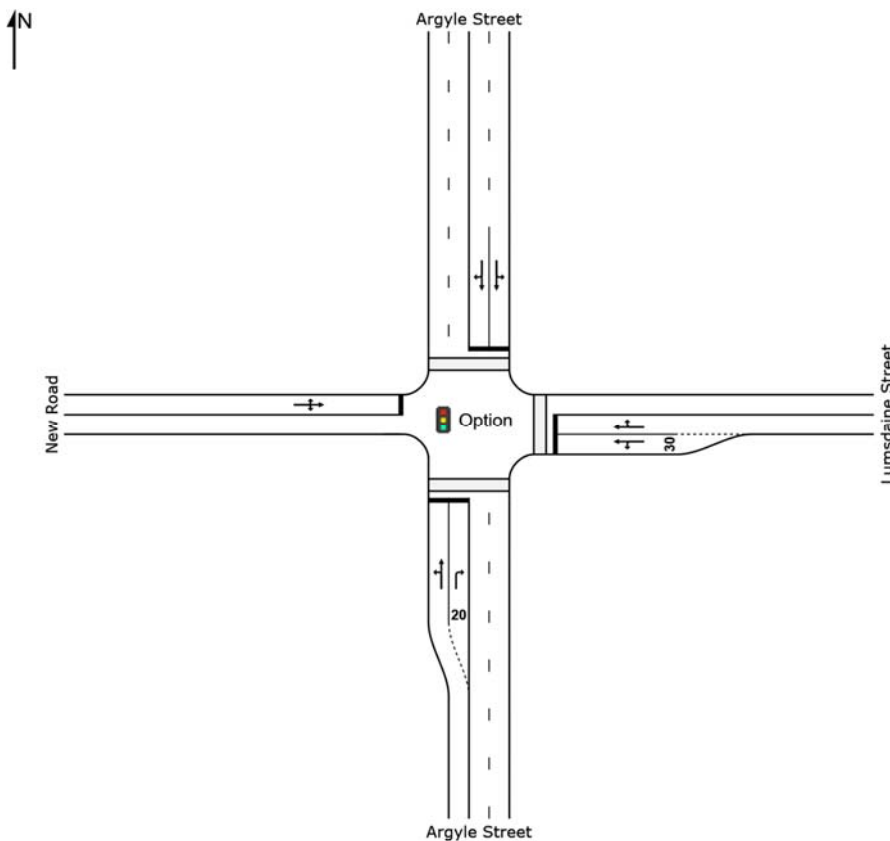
Argyle Street / Lumsdaine Street Proposed Signal Control Plan
